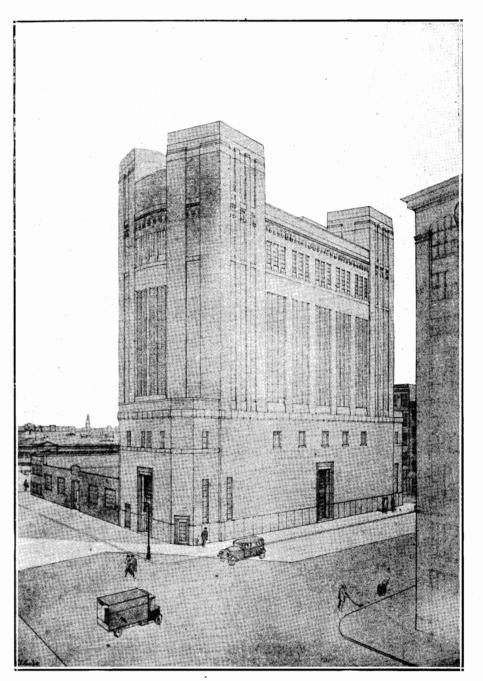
Land Ventilation Building, New York. Contract No. 13.
